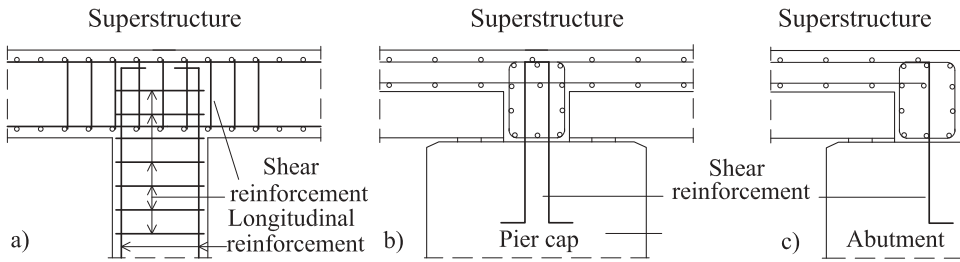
Typical monolithic joints. (a) Piers are joined directly to the deck (MJ1). Shear reinforcement is applied between: (b) the deck and the pier cap (MJ2); (c) the deck and the abutment (MJ2).
